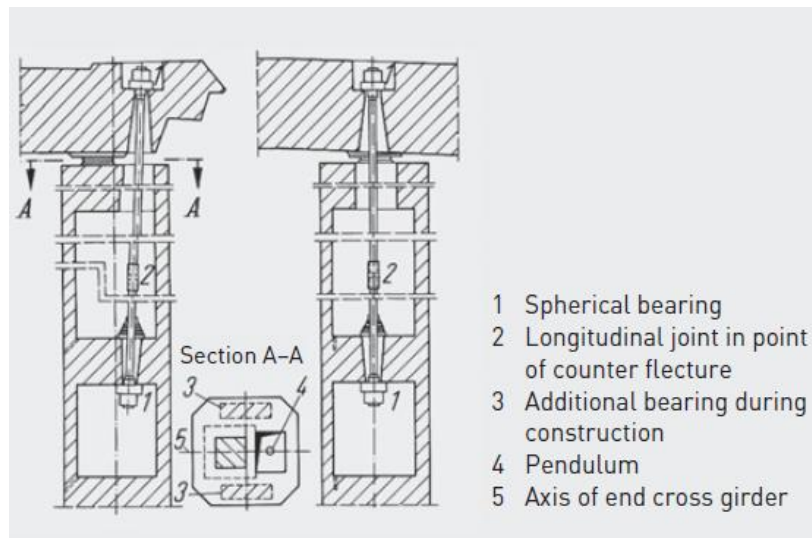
Typical Layout of a Pendulum (Svensson, 2012)
